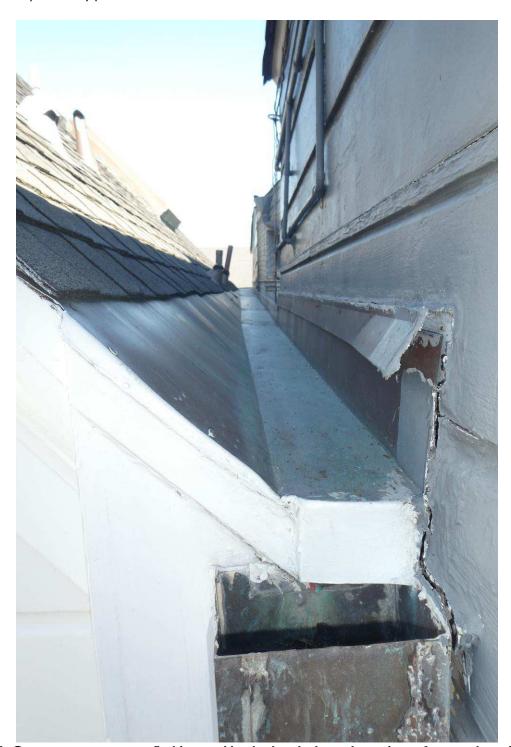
Copper gutter, counterflashing, and leader head where the main roof meets the neighboring building to the northeast.
